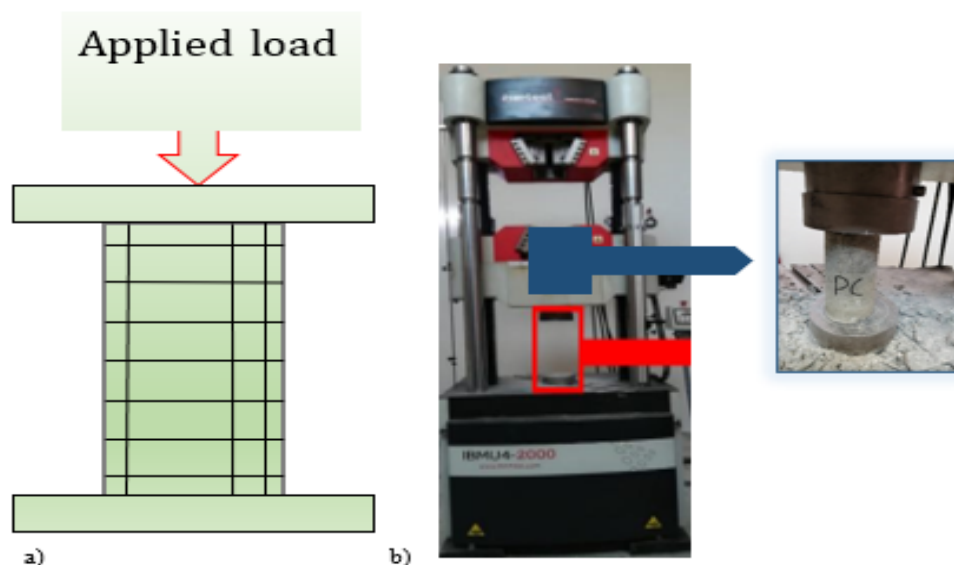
Concentric Load Mechanism: a) Schematic Diagram and b) Experimental Test Set Up with Actual Prototype to be Placed
